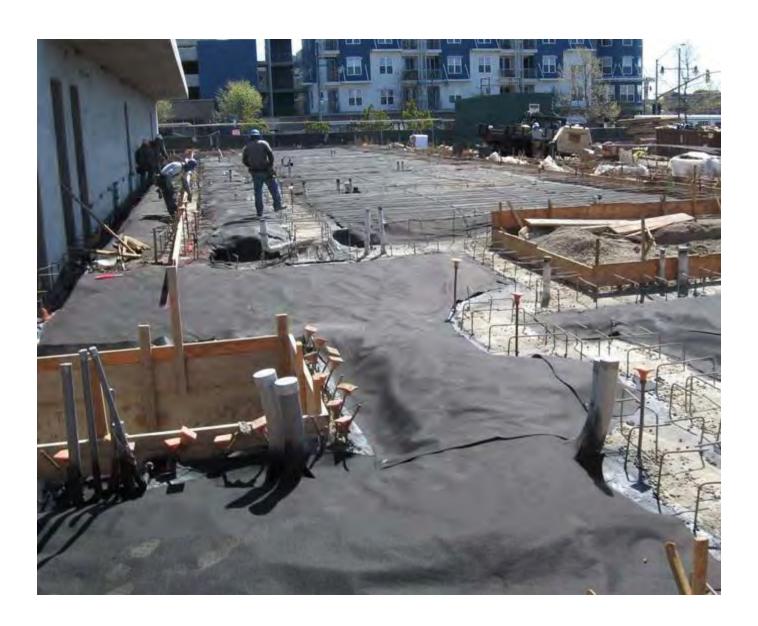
Protective Ultra Shield-1000 Fabric Installed over Liquid Boot at Building 3
